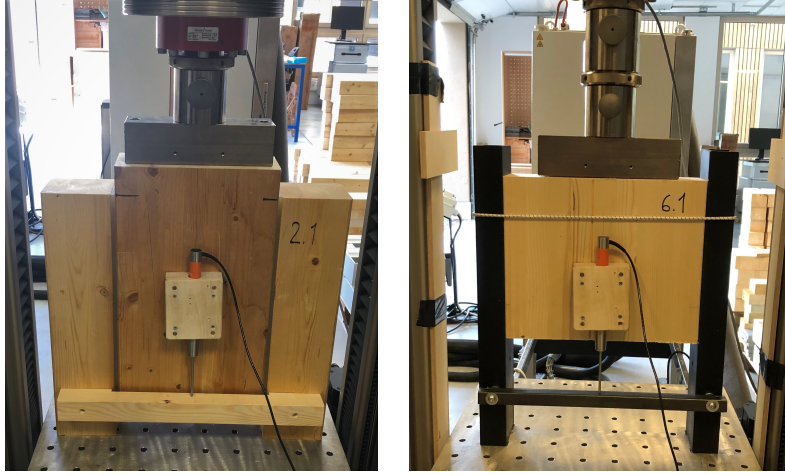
Timber-to-timber and steel-to-timber setups.
